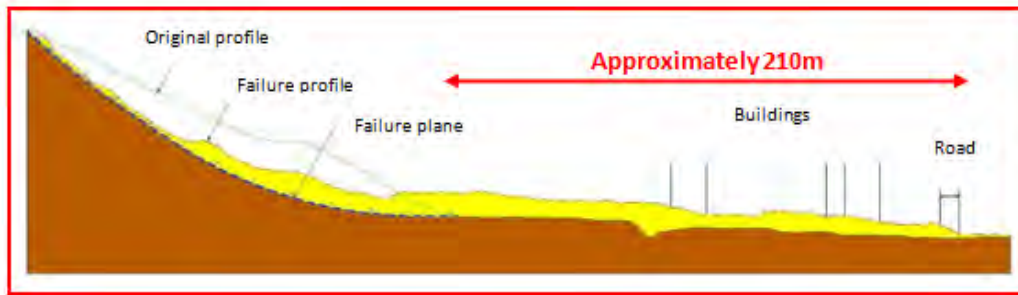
Cross-section showing the Estimated Failure Plane and Failure Run-out Distance of 210 m
